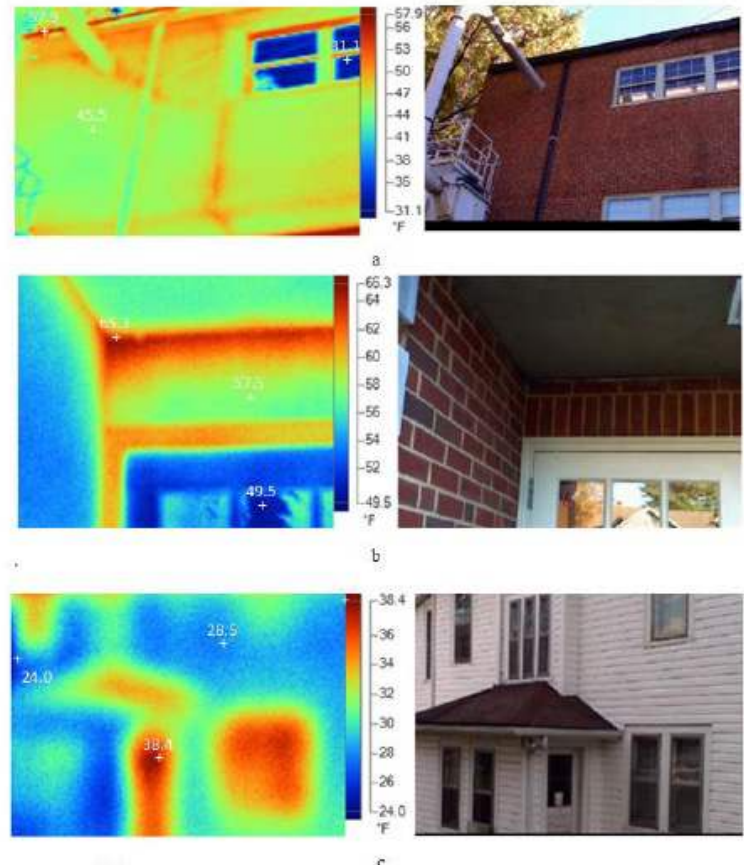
(a, b, and c). Thermal and Visible Light Images Showing Heat Loss Due to Wall Cracks and Thermal Bridges
